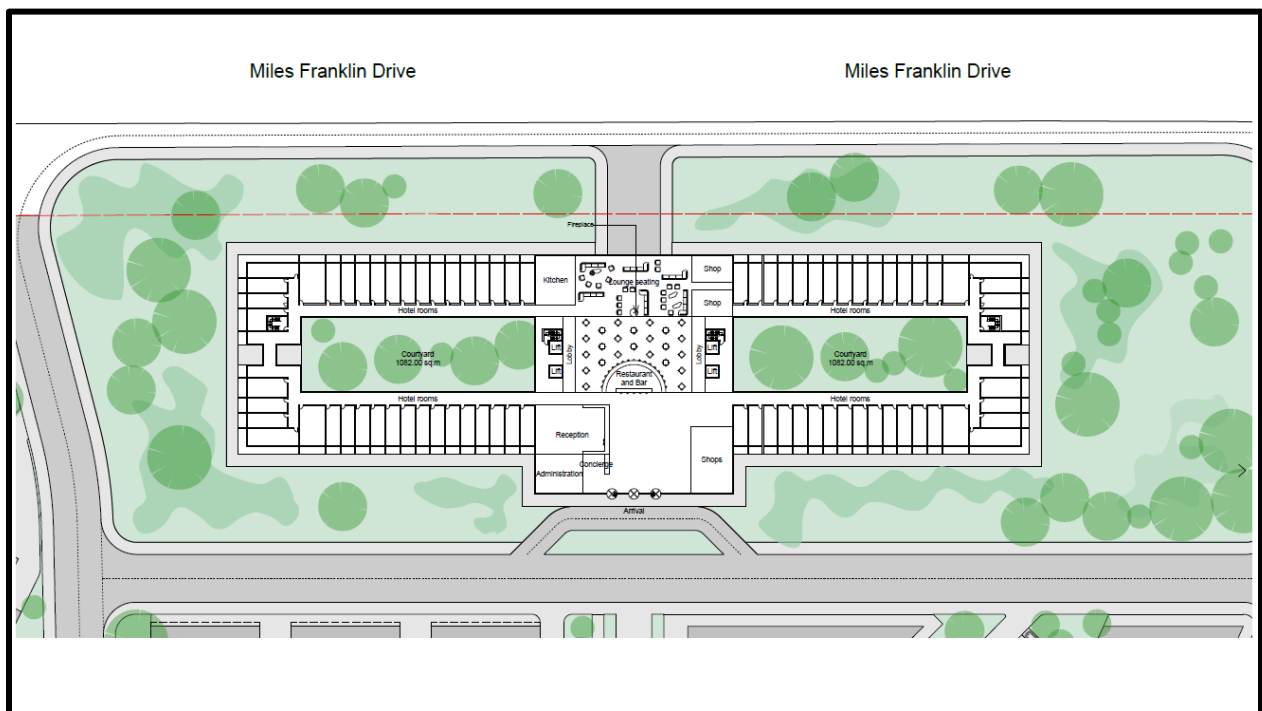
Spa Hotel Ground Floor Plan (Source: Robert Harwood Architects)
